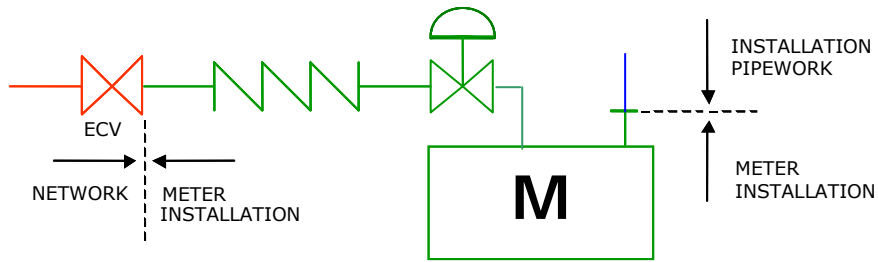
RECOMMENDED ARRANGEMENT.
